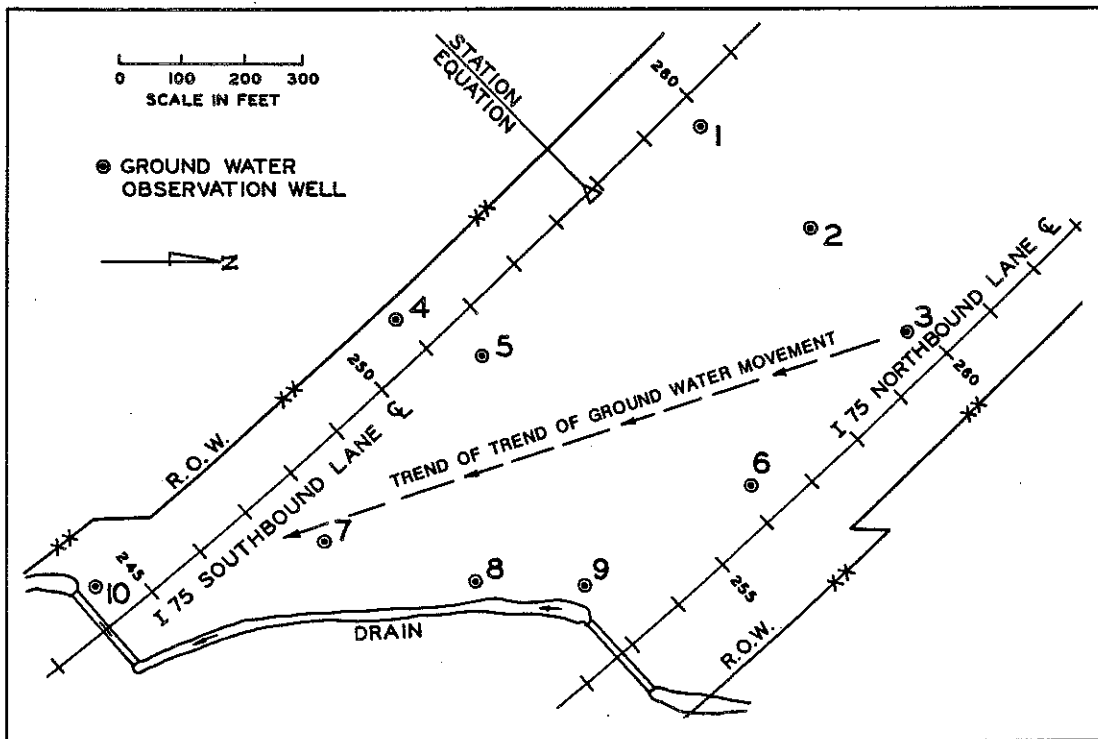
I 75 well locations: I 75 south of West Branch (Section 16, T21N-R2E, Horton Twp, Ogemaw Co.). Roadway opened to traffic in 1971.
